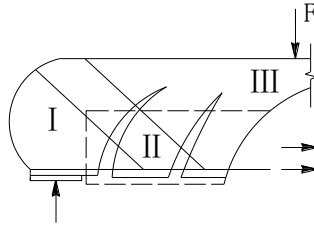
Mechanical model of box girder after diagonal cracks appear
